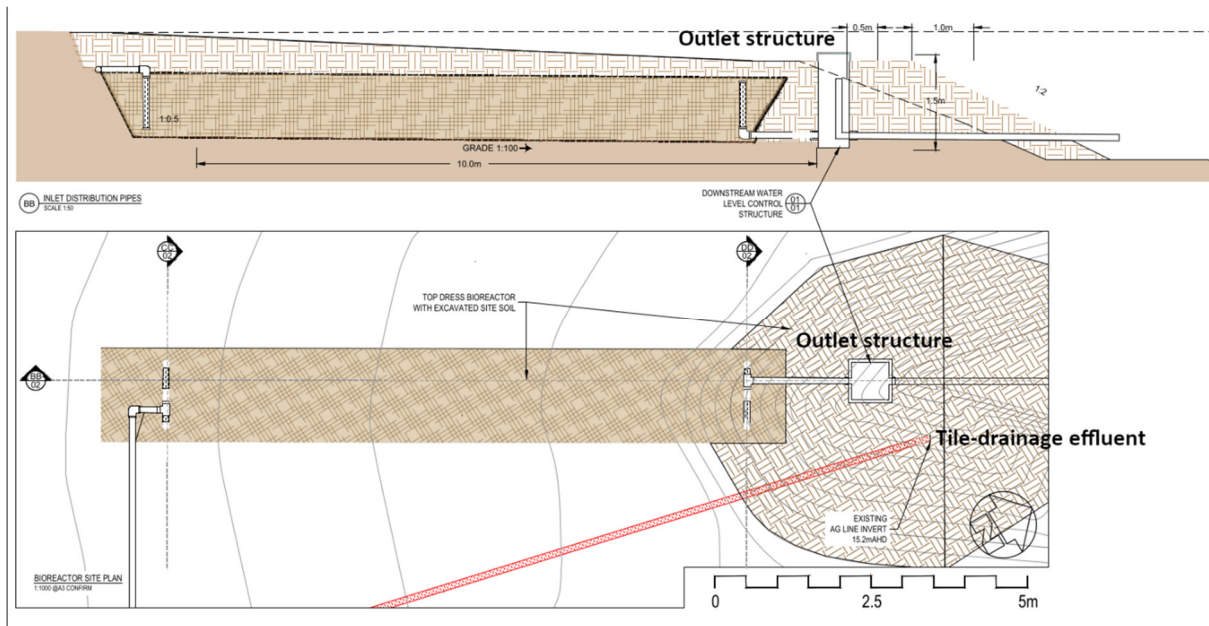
Schematic of the off-line bed BR3. The bed was connected to a tile-drain using a 100 mm diameter to divert all the subsurface water flow into the bioreactor. Influent samples were collected from a T-section installed at the inlet. An outlet control structure was installed downslope of the bed to collect effluent water samples. The woodchip within the bioreactor was kept constantly saturated due to the outlet pipe installed at the top of the bed.
